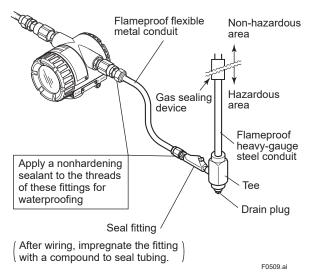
Typical Wiring Using Flameproof Metal Conduit
